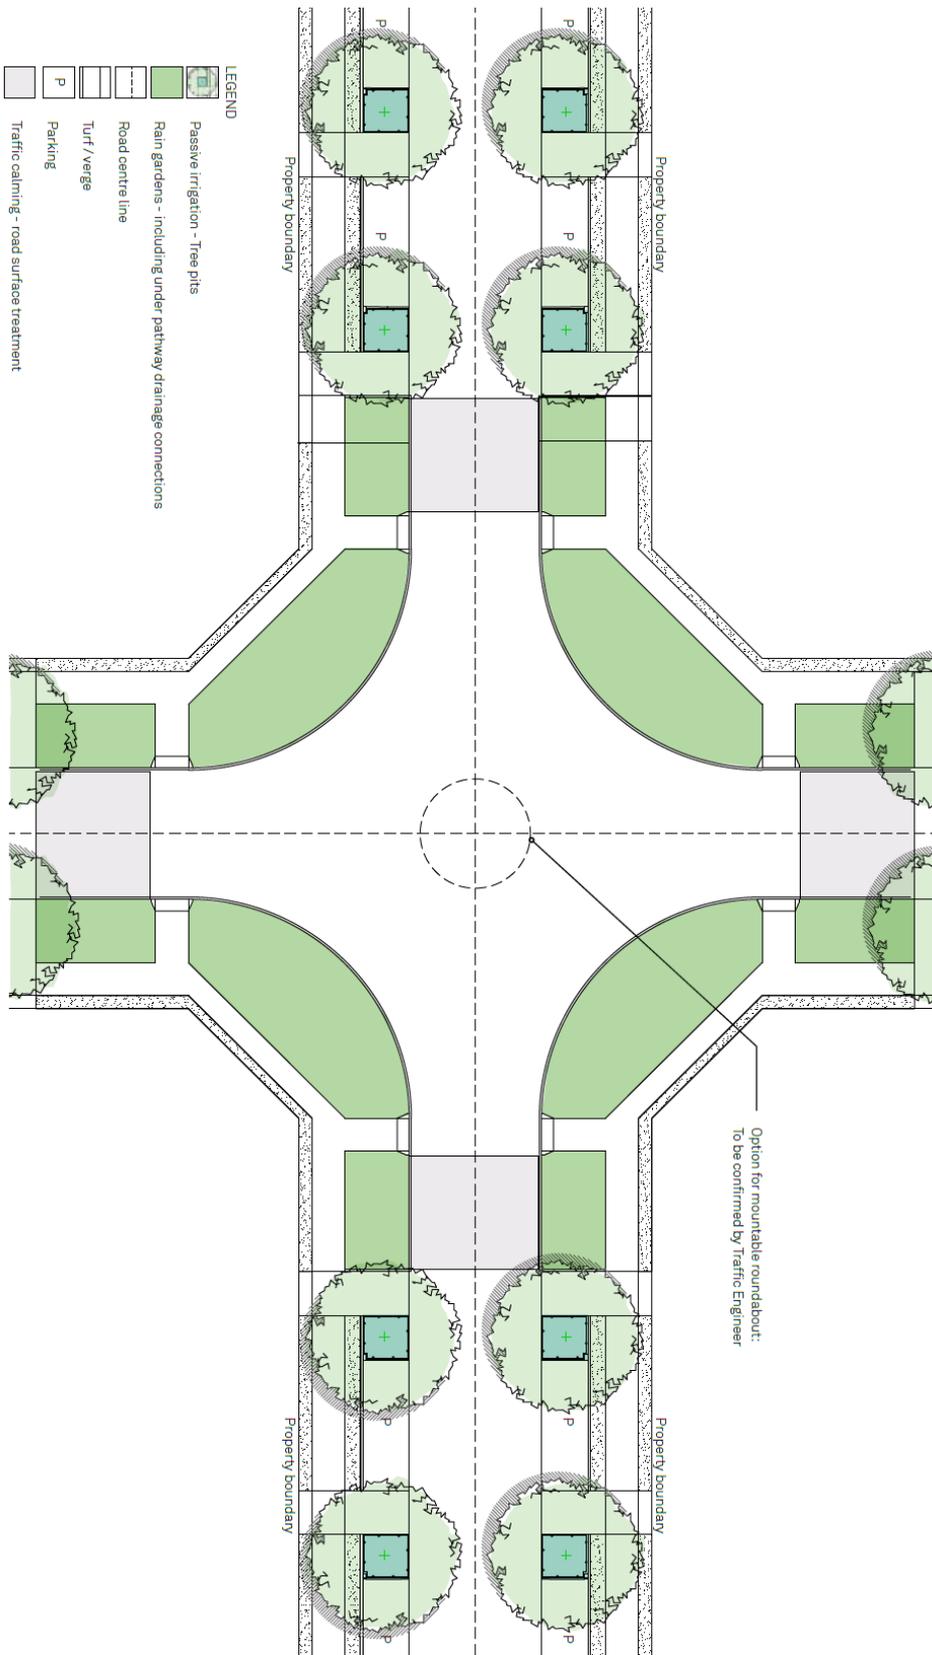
Typical local street intersection profile including Rain Garden and textured thresholds
